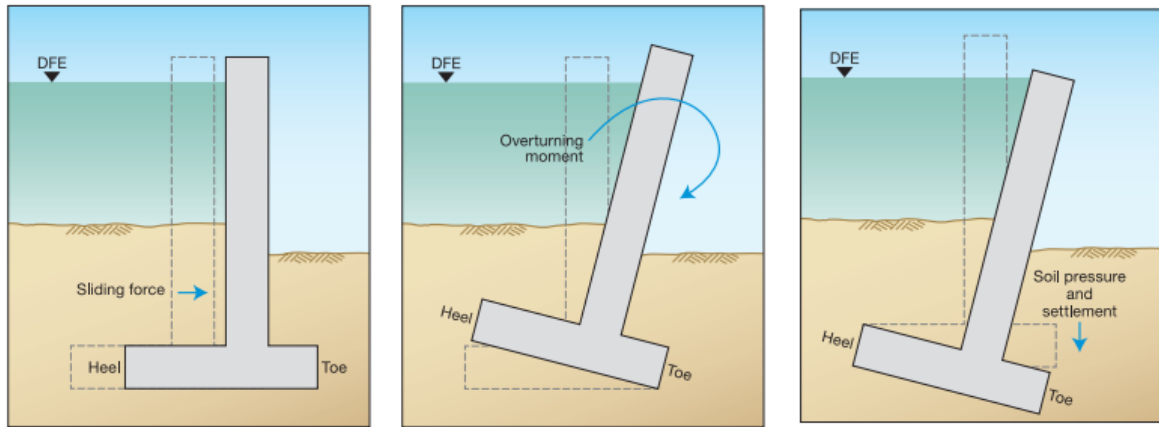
Failure by sliding, overturning, and compression failure of foundation (FEMA259, 2012)
